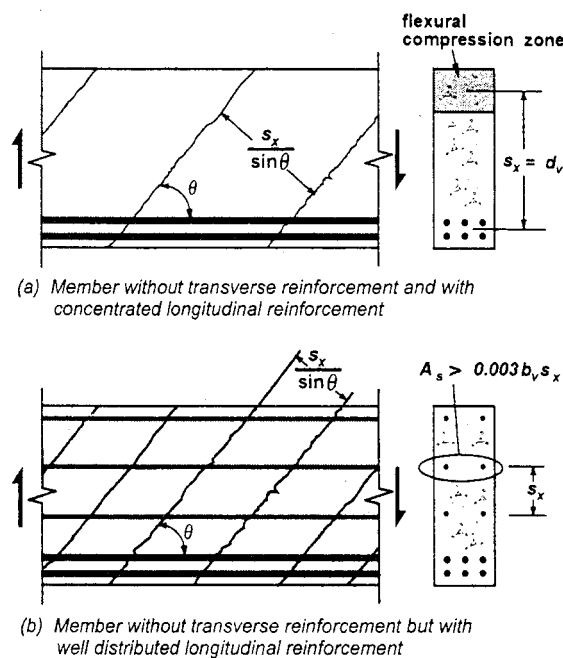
Definition of Crack Spacing Parameter s_x .
